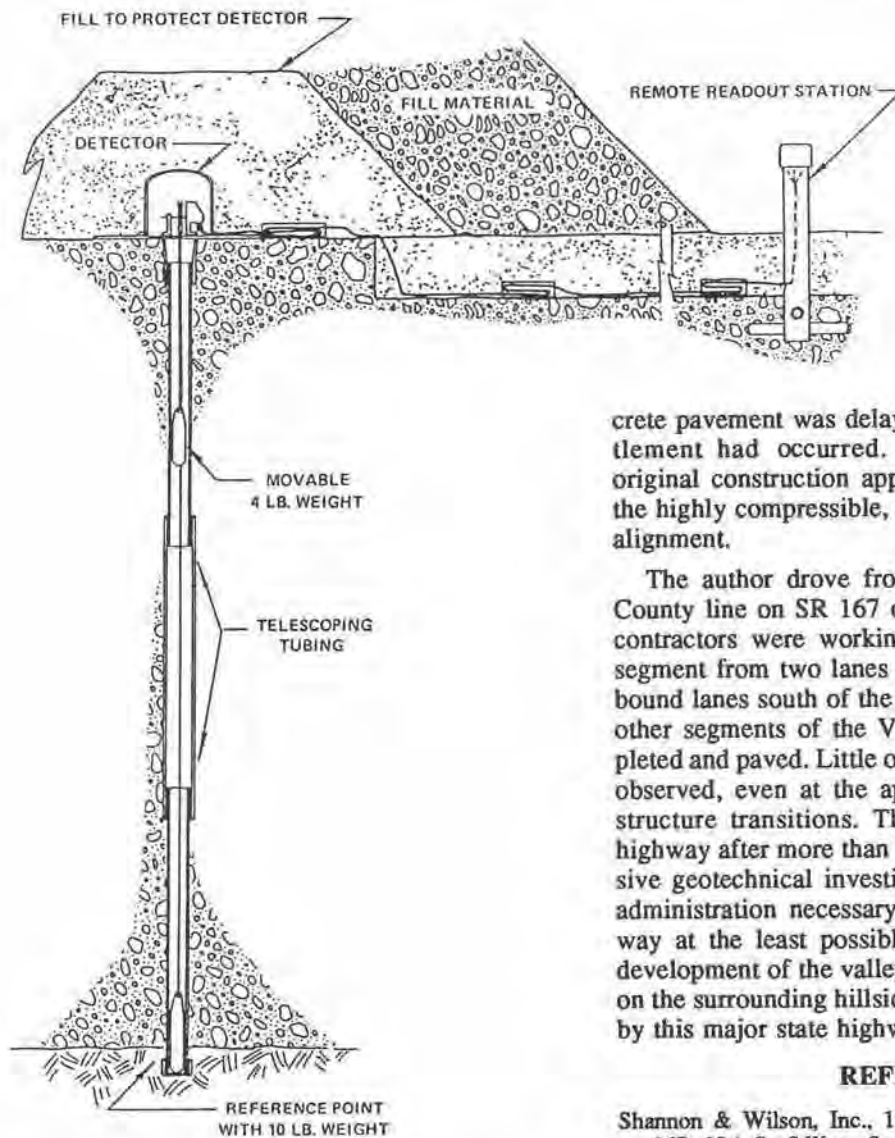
Electrical settlement monitoring instrumentation designed for the Valley Freeway (SR 167) project and installed in bridge approach embankments.
